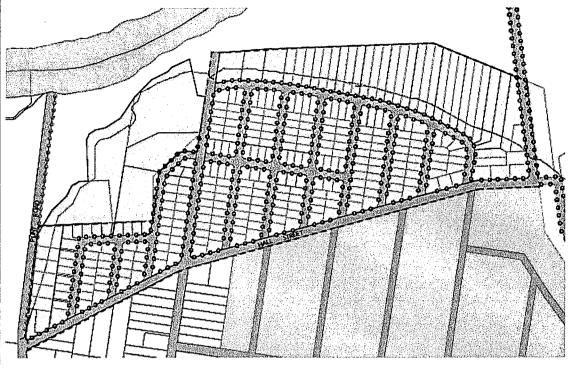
Detailed Plan of Bona Vista Precinct
